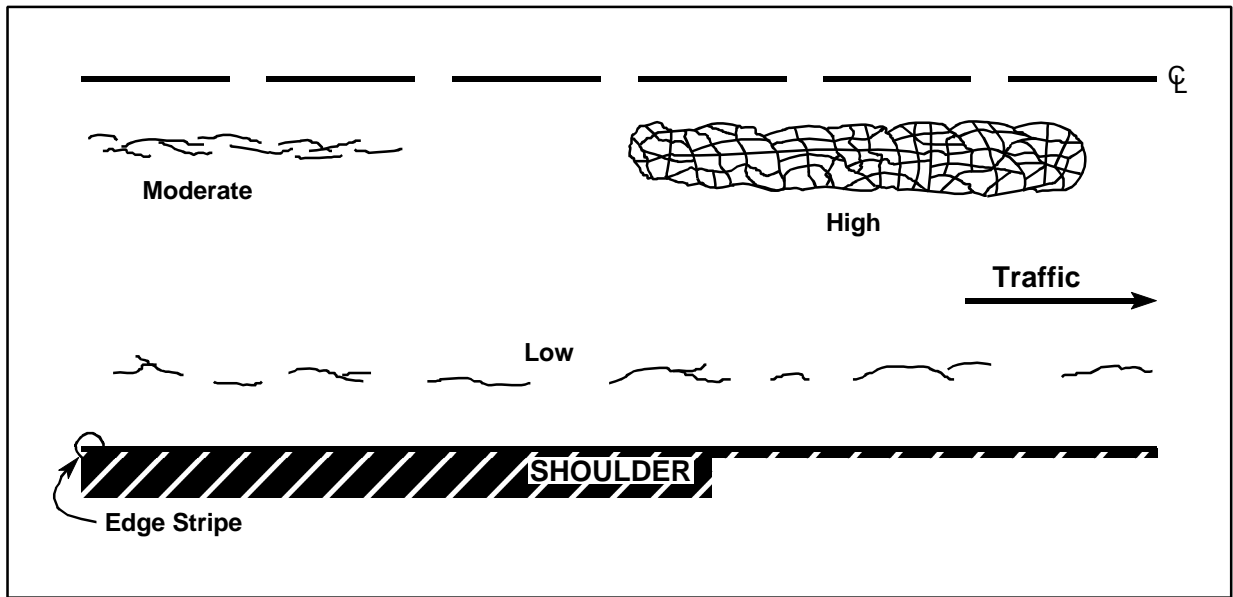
Example figure of fatigue cracking in asphalt concrete pavements.⁽²⁾
